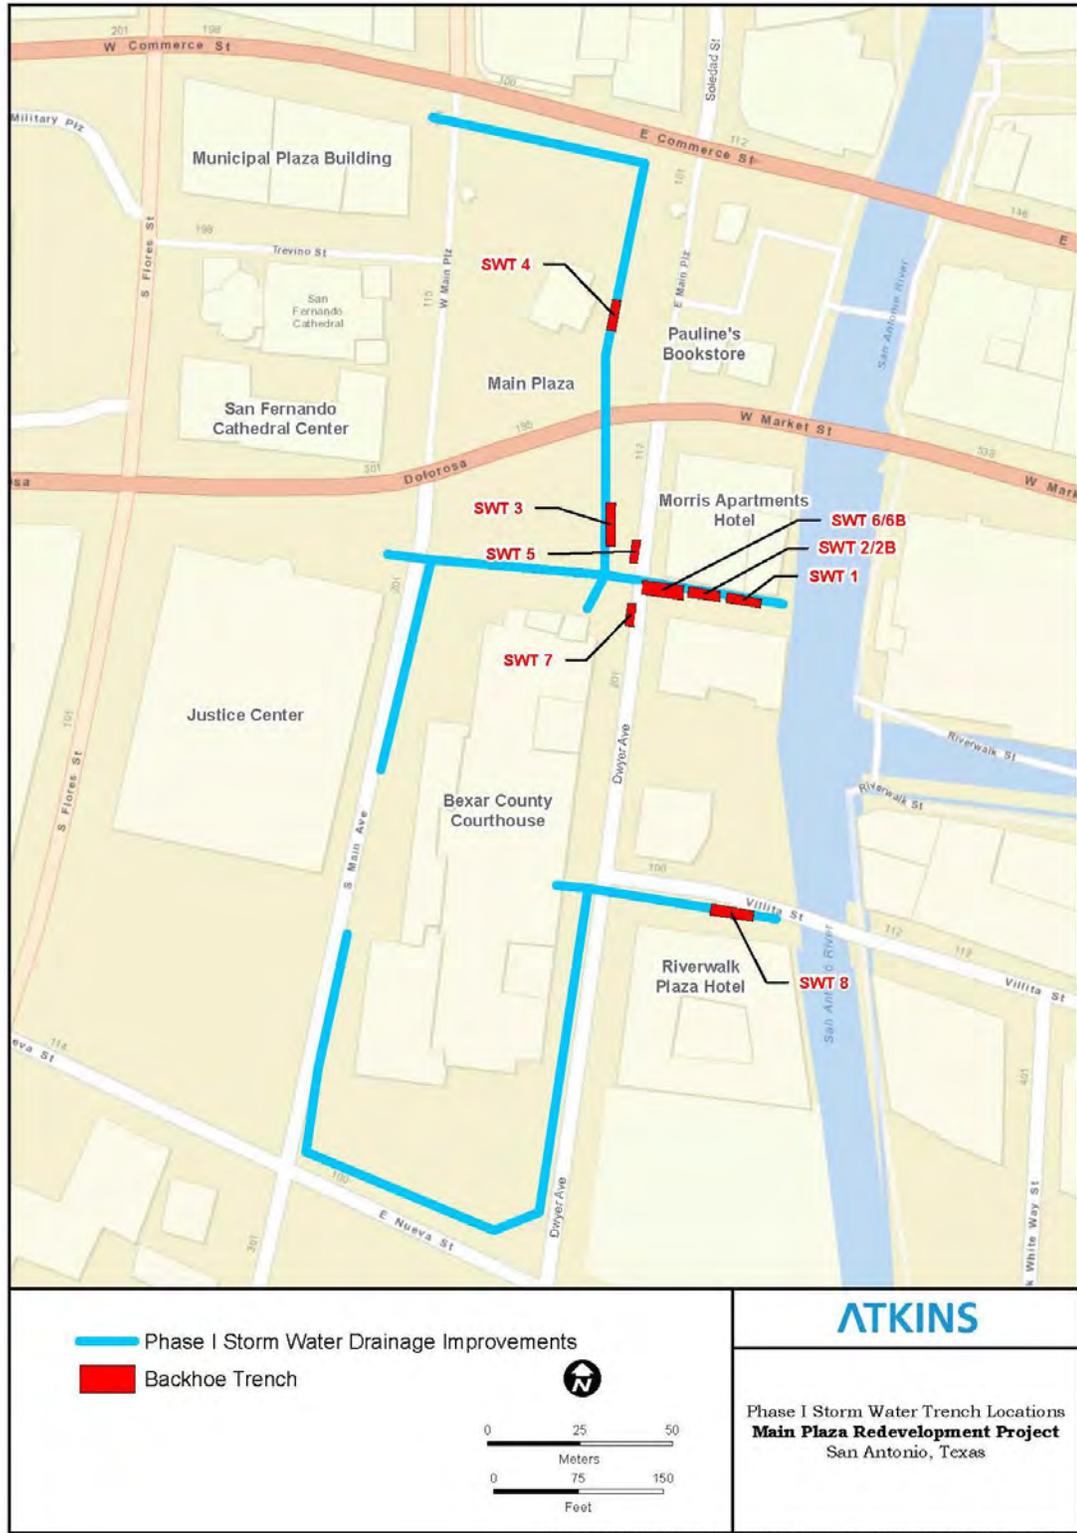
Locations of storm water trenches excavated for Main Plaza Renovation Project Phase I.
